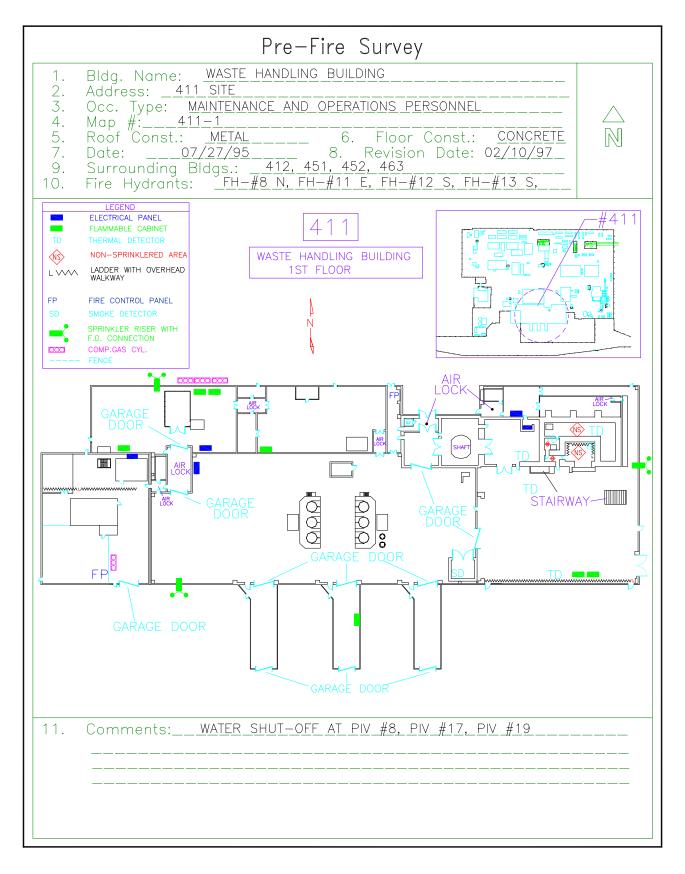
Waste Handling Building Pre-Fire Survey (First Floor)
